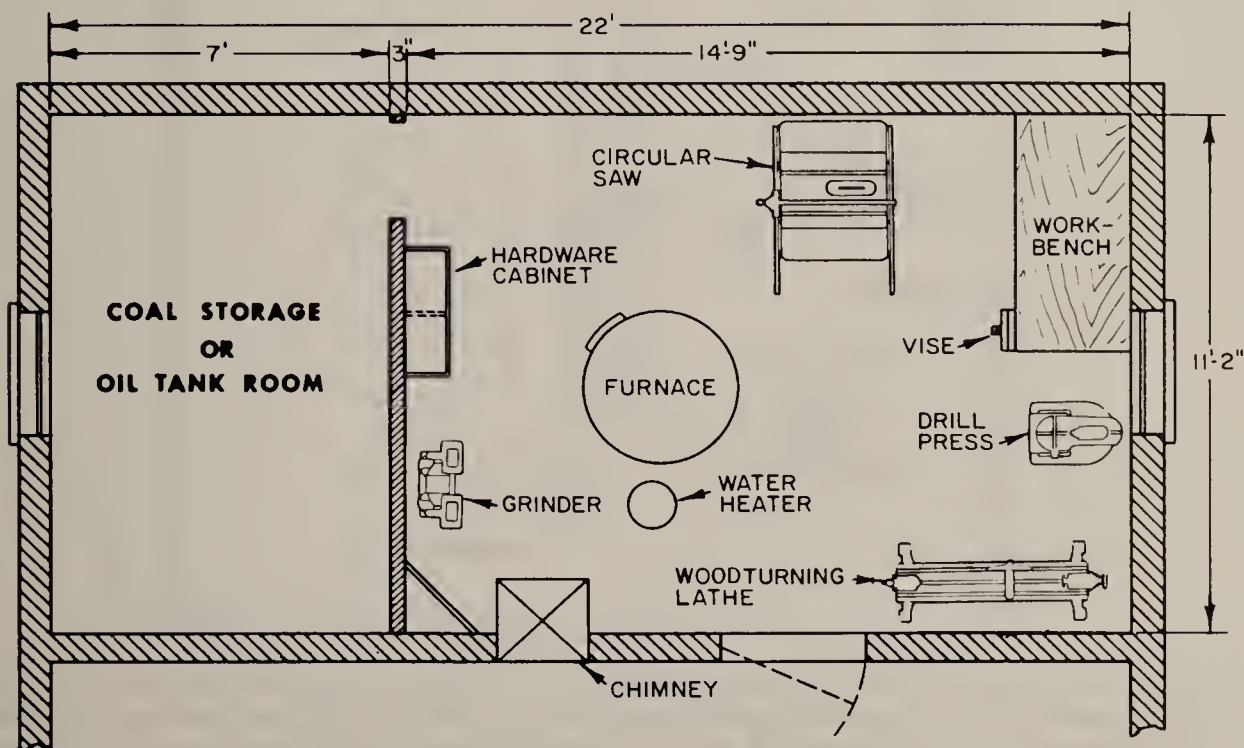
Typical basement workshop with power tools placed in the furnace room of a divided basement. Because of the fact that the suitable basement space is in many instances occupied by laundry equipment, storage rooms and the like, consideration should be given to utilizing the furnace space for only a few of the most needed power tools.
